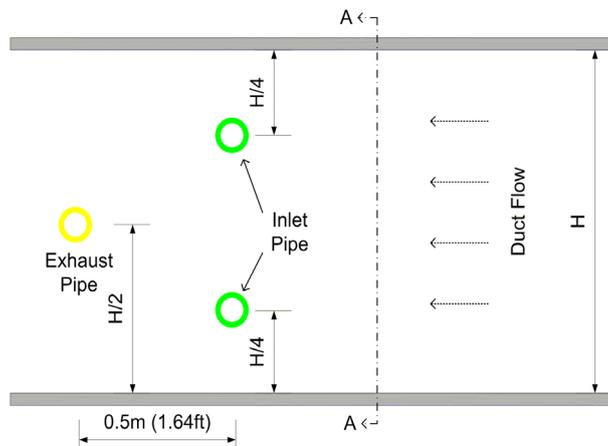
Side view of the inlet and exhaust pipe positions for a large duct.
